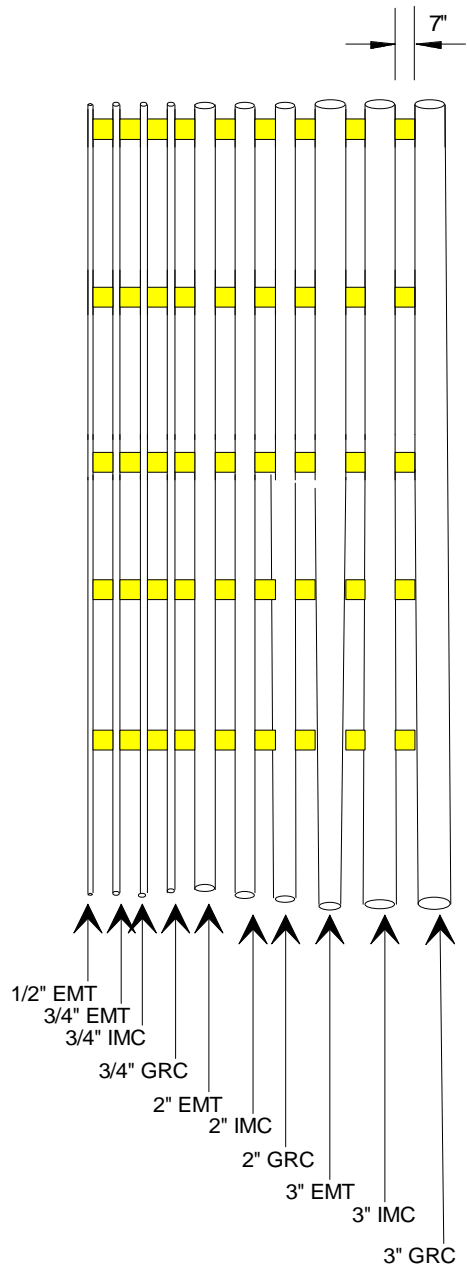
Illustration of the Layout of Ten Runs of Steel Conduit. Power Conductors Were Enclosed But Not Shown. Total Length of Each Conduit Run is 256 Feet. Wood Blocks Were Used to Space the Steel Conduit Systems.
